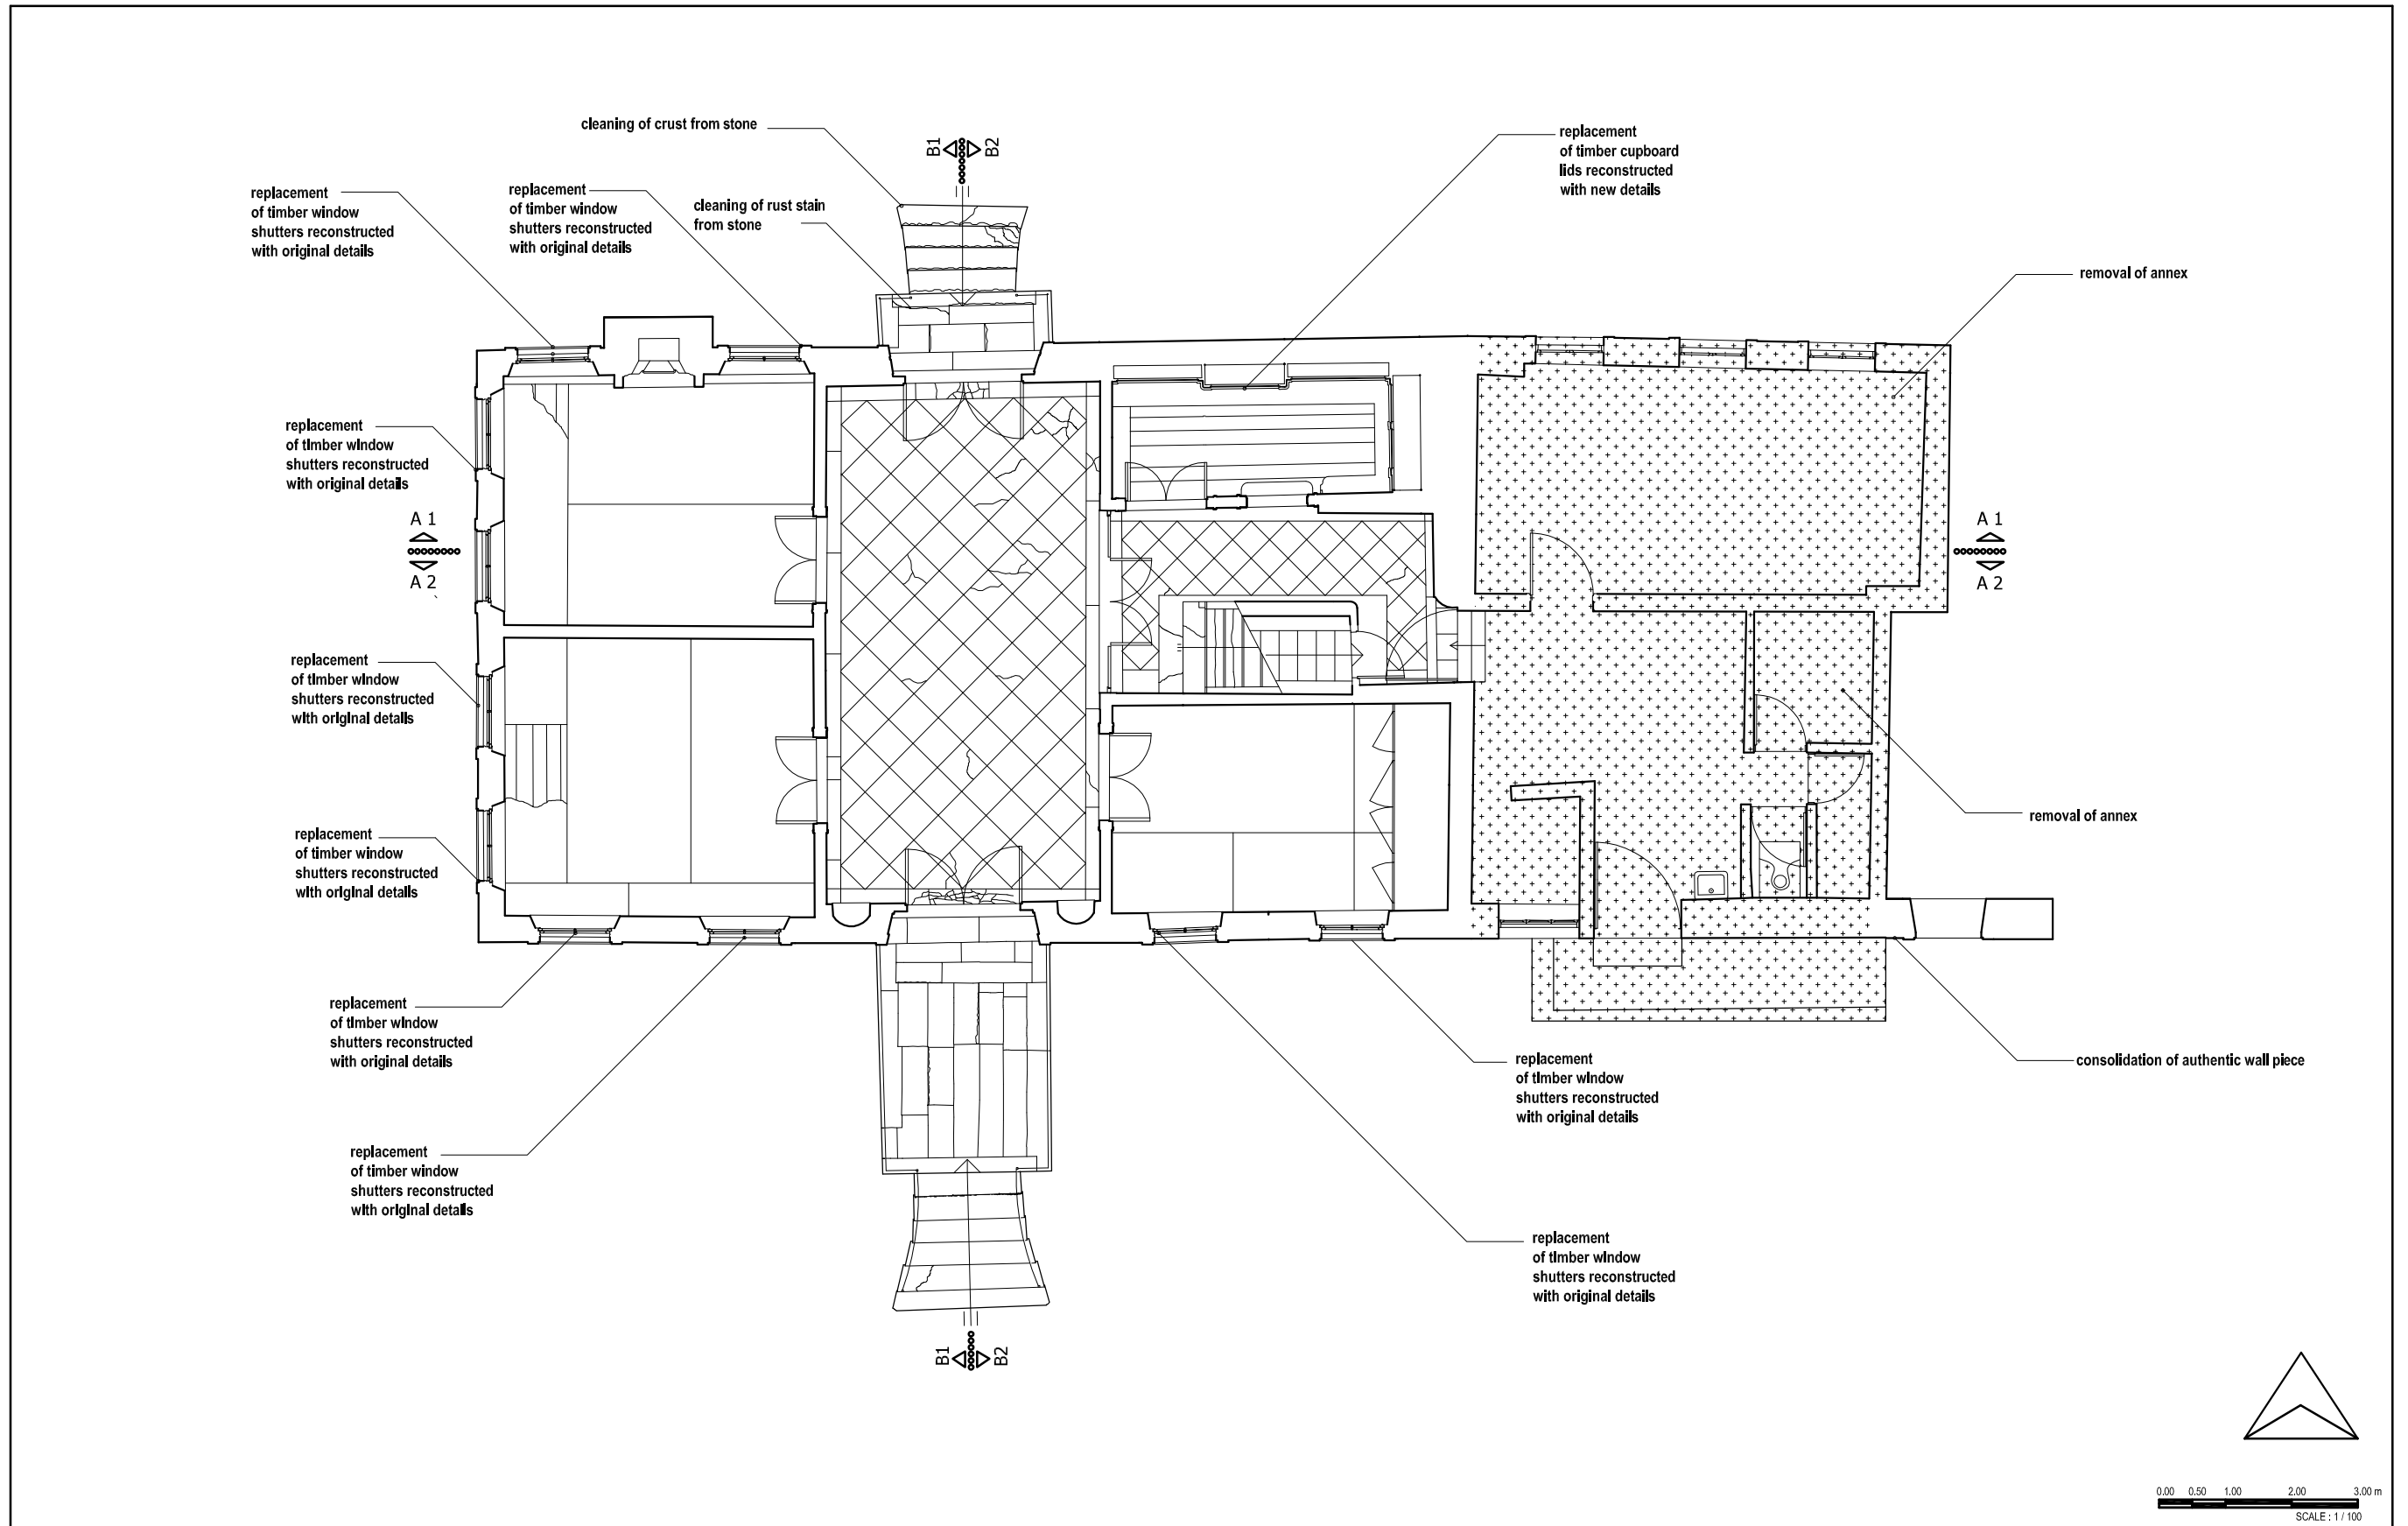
Measures for Ethics of Conservation- Ground Floor Plan
